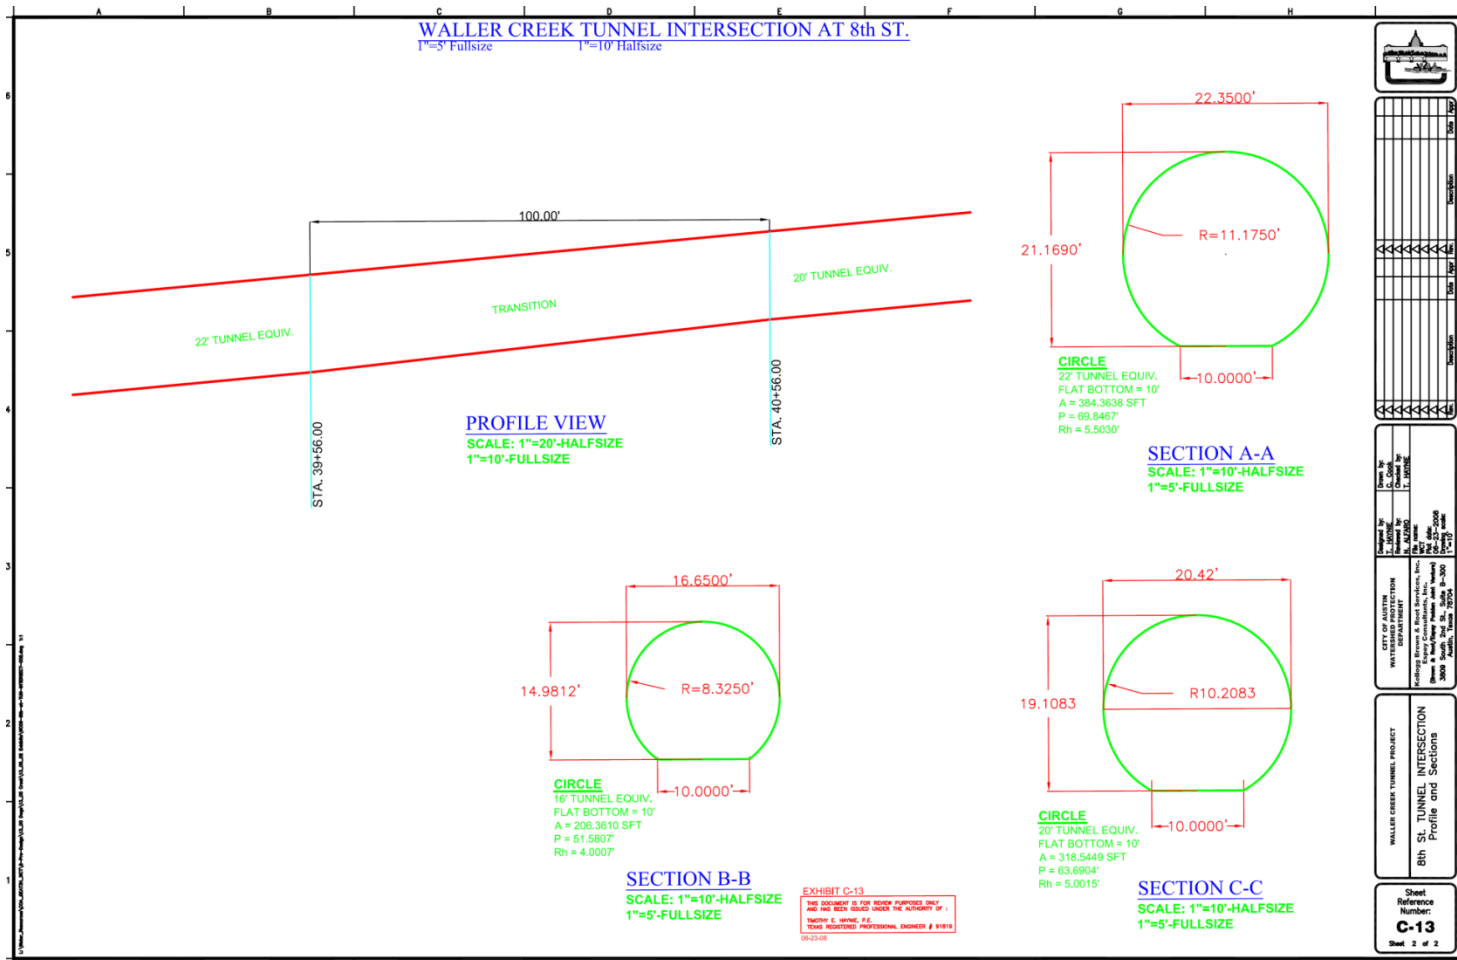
Waller Creek Tunnel Project; Tunnel Intersection at 8th Street–Profile and Sections
